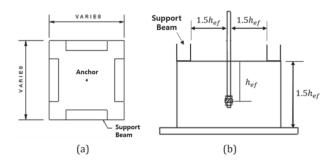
Details of tensile test setup. (a) Plan. (b) Specimen size.
